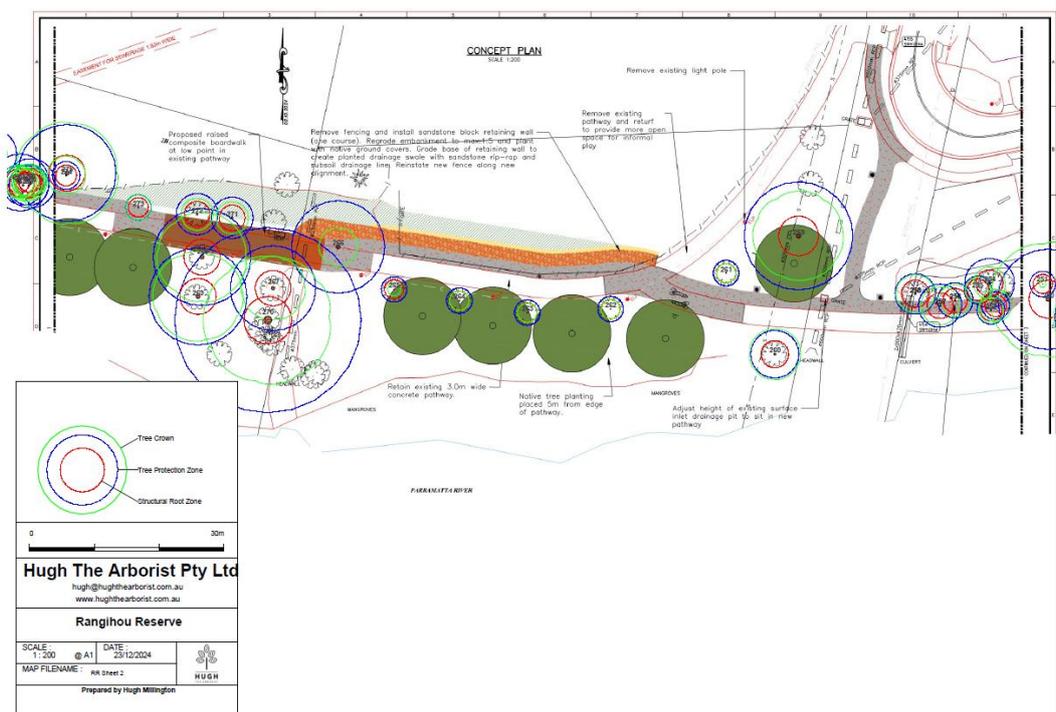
Site Plan (Sheet 2). Source: Hugh The Arborist
